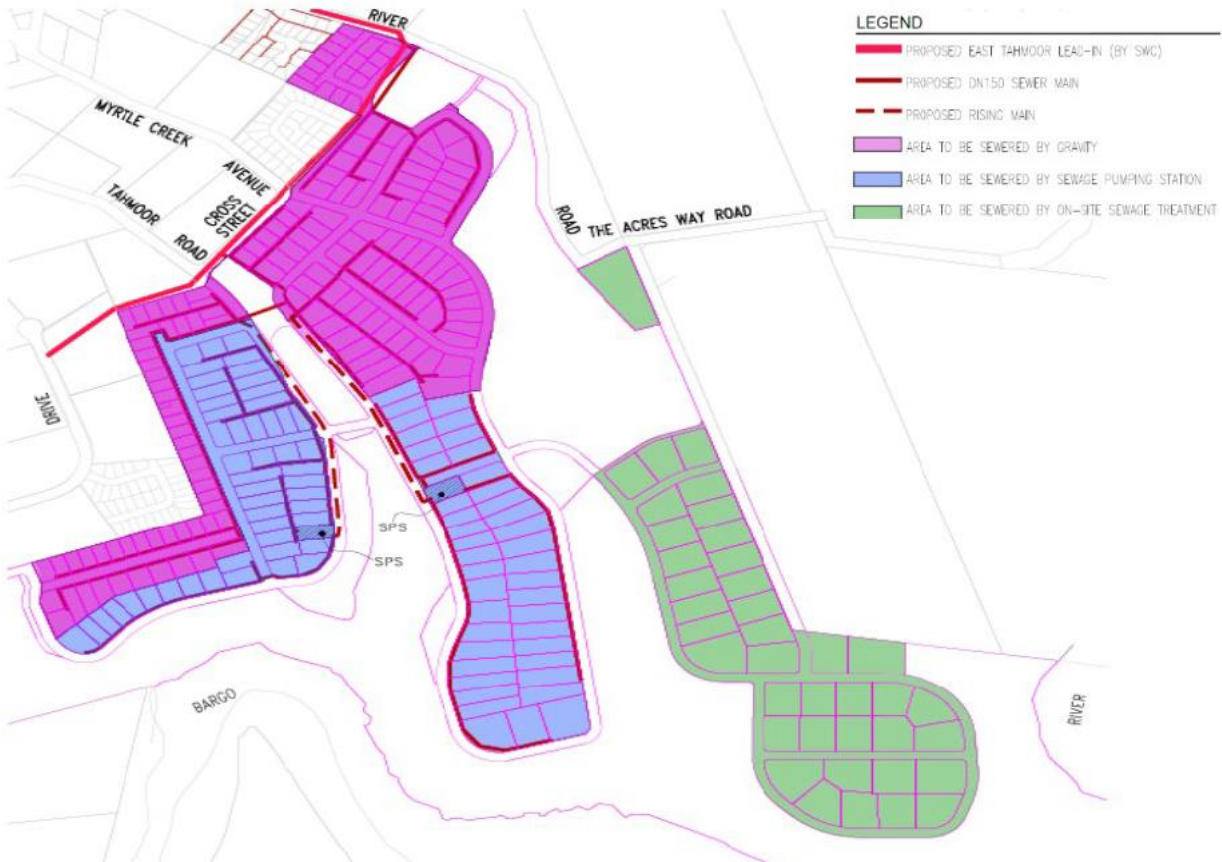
Sewer Servicing Strategy (source: Planning Proposal)
